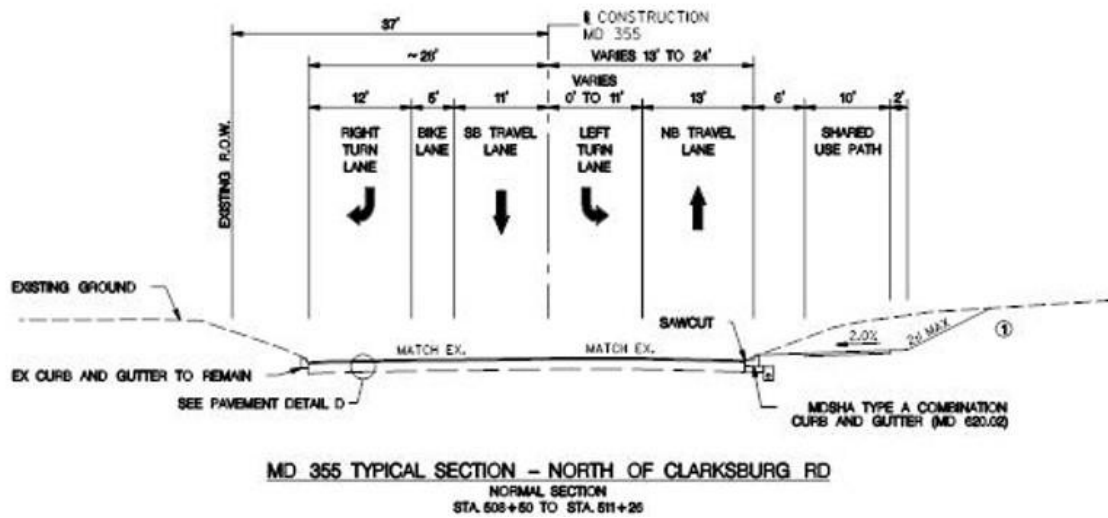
Frederick Road - North of Clarksburg Road Cross Section
